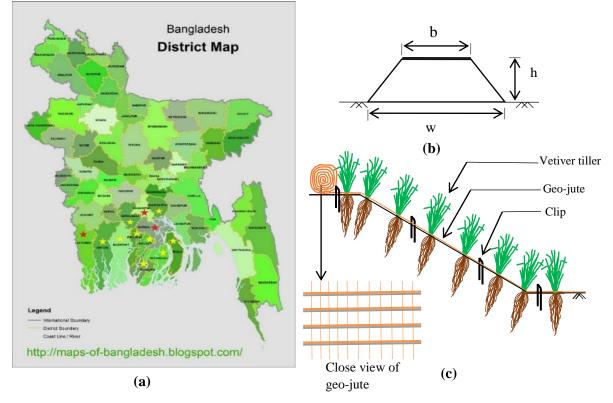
(a) Study areas of CCRIP, (b) typical road section of LGED (top width: b, bottom width: w, height: h) (LGED, 2005) and (c) Schematic diagram showing vetiver plantation scheme
